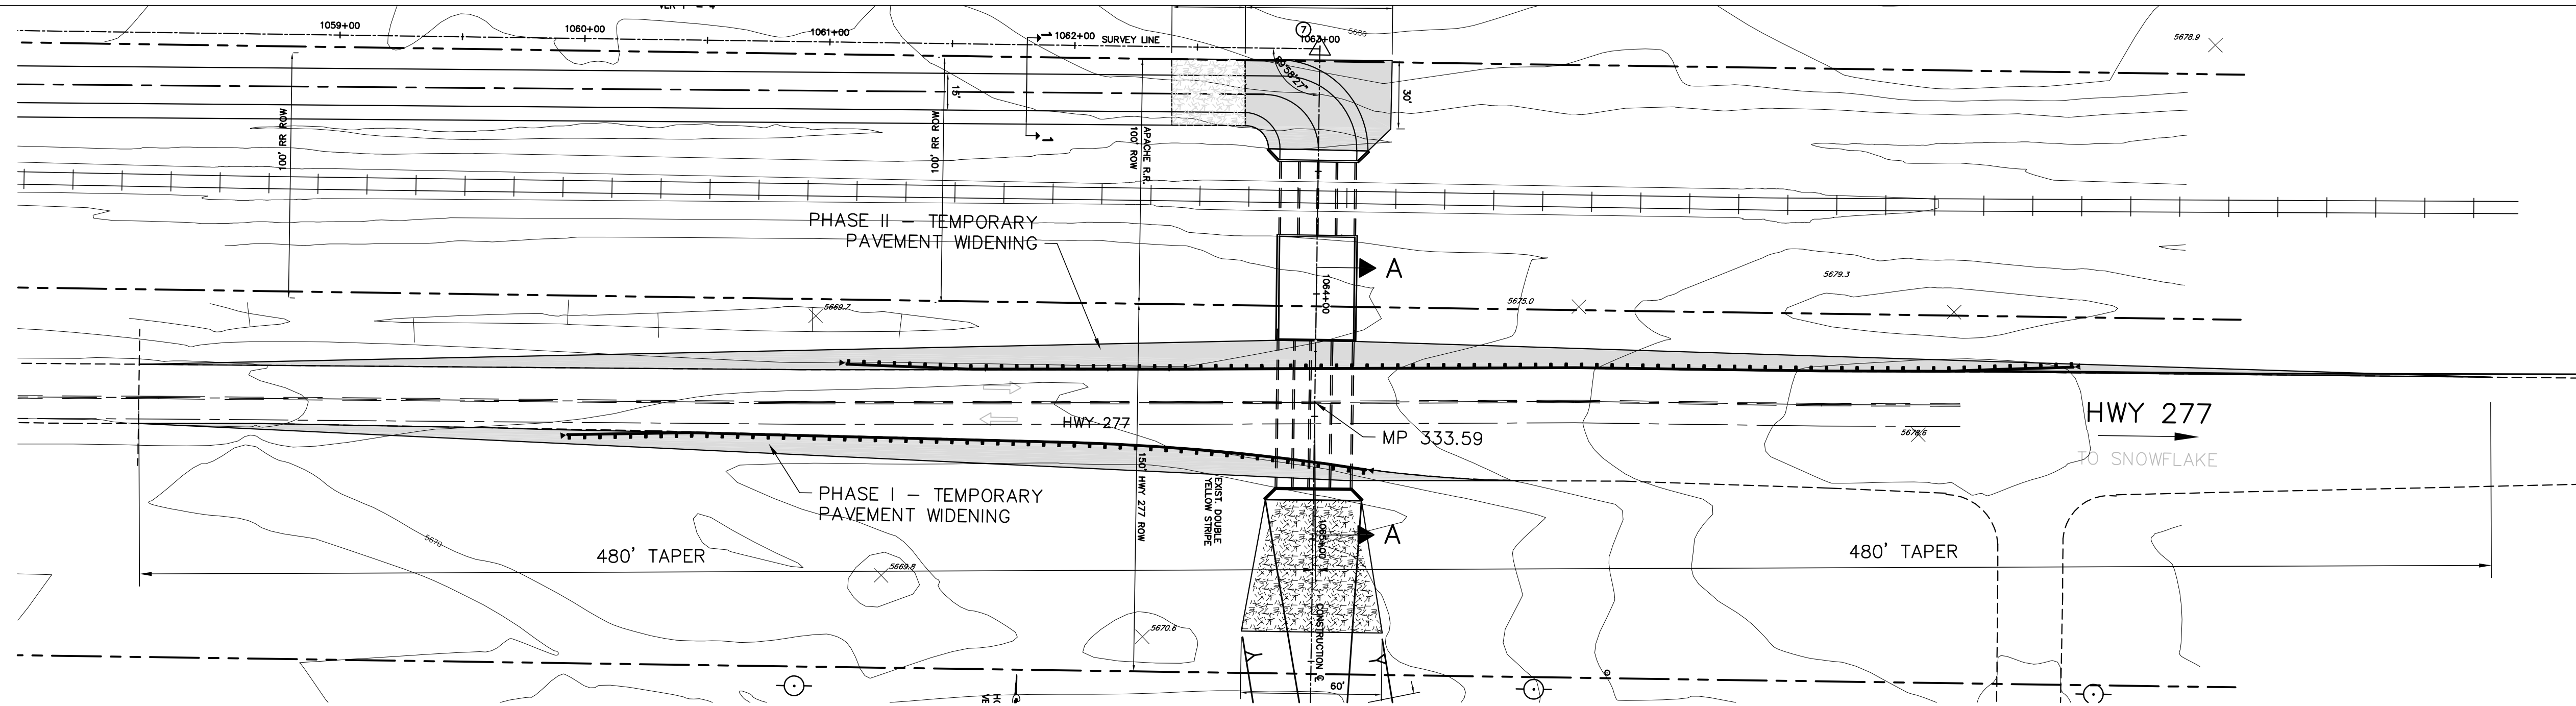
BACKFILLING - OPEN CUT CONSTRUCTION
